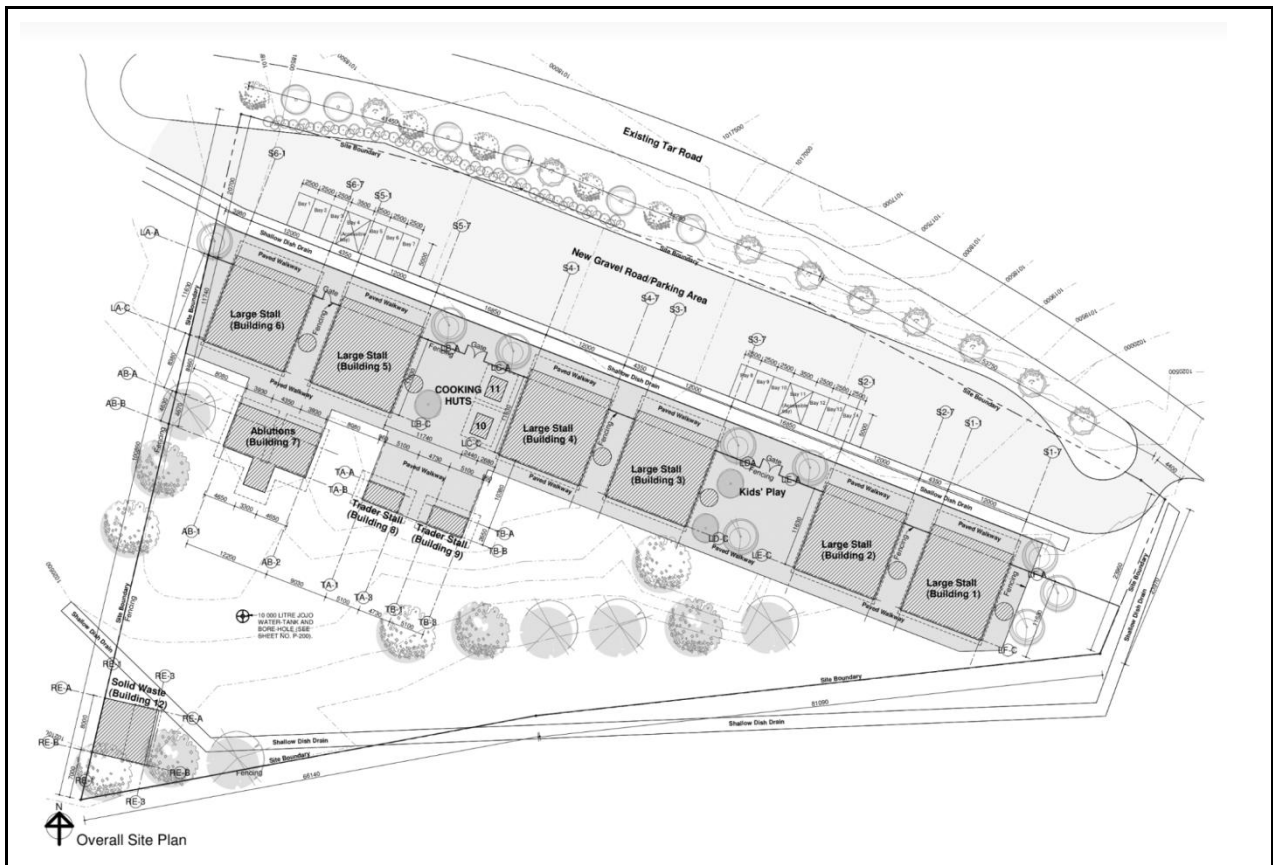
Jopa Market - Building Block Layout (refer to Annex 2 Technical Drawings for details & dimensions).
